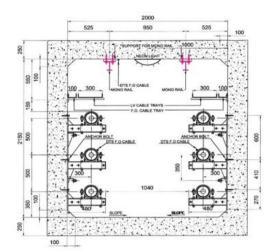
A: 400 kV Cable arrangement inside Tunnel
